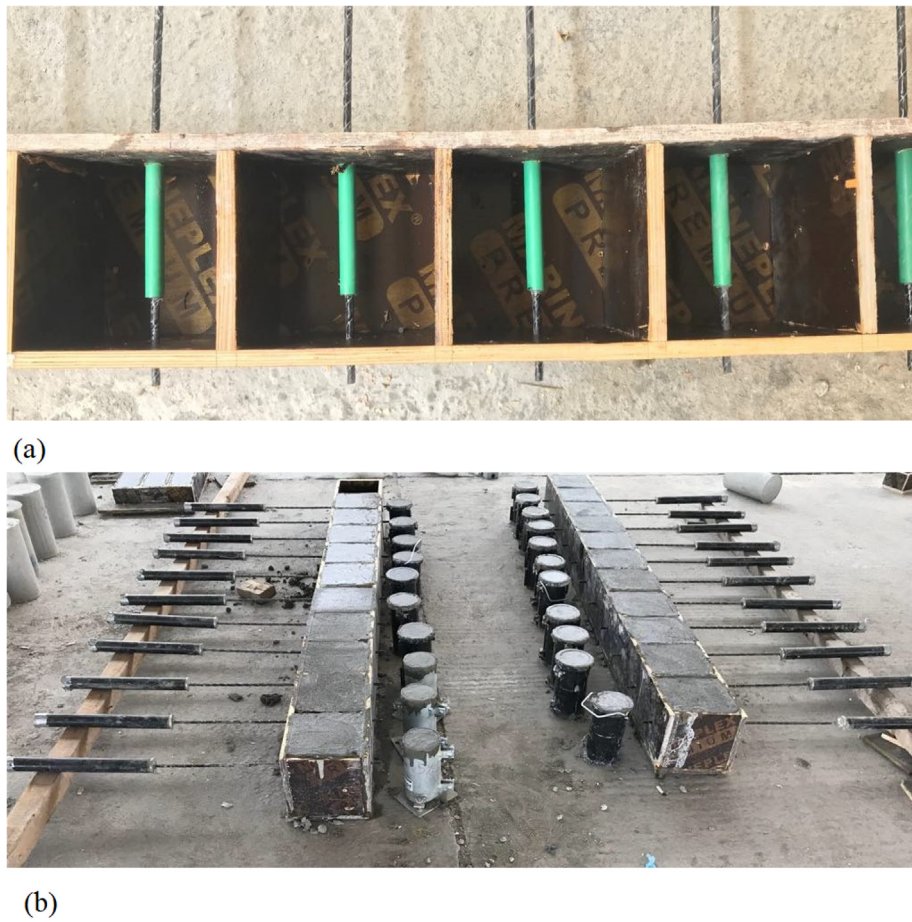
(a) Plywood Molds; (b) Casted Specimens.
